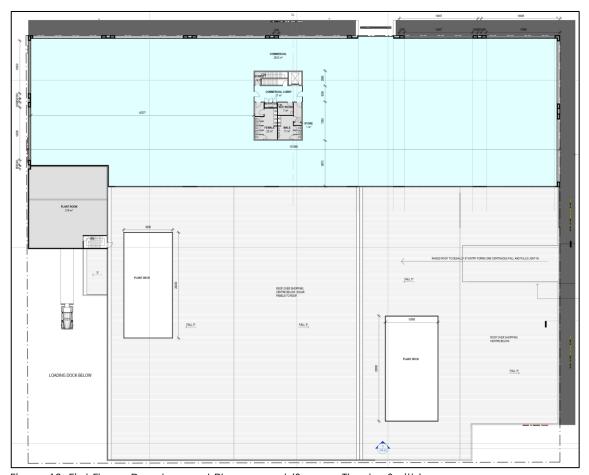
First Floor - Development Plan excerpt (Source: ThextonSmith)
